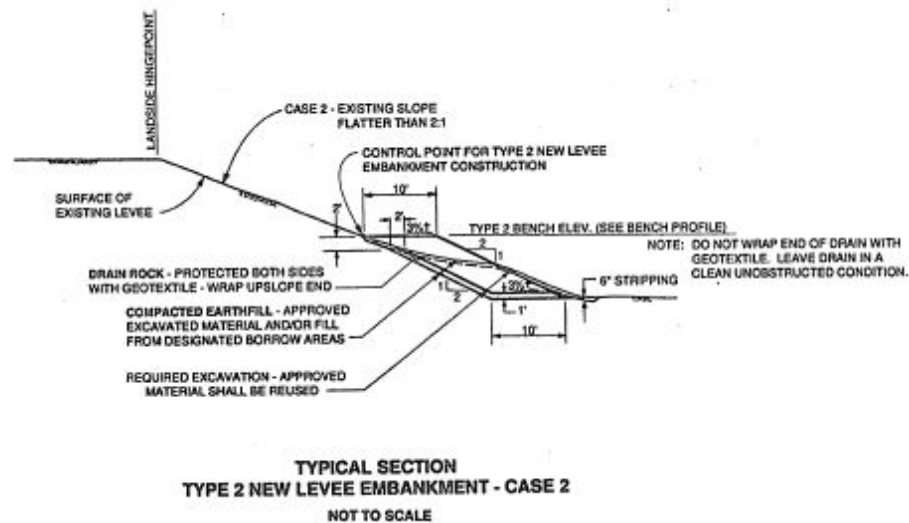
Sacramento River Levee - Typical Stability Berm Section
